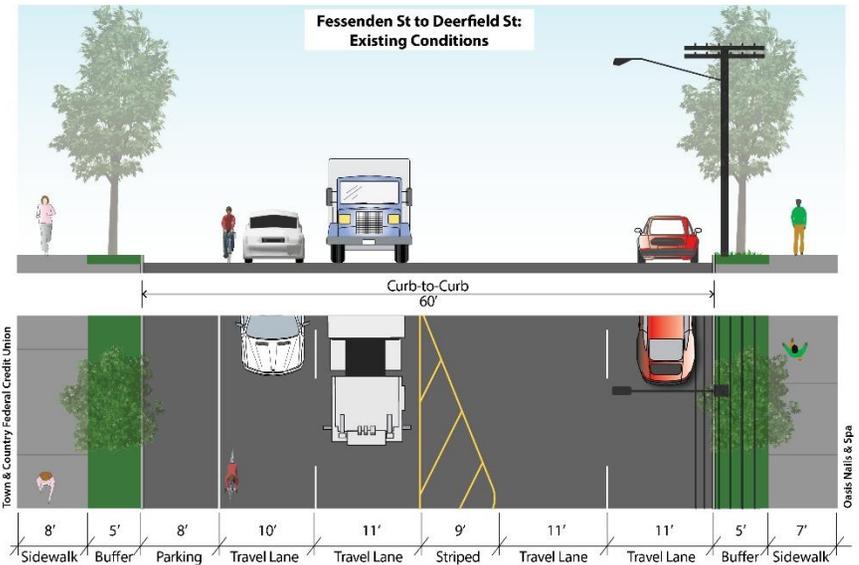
Existing Layout – Forest Avenue from Deerfield Street to Fessenden Street
